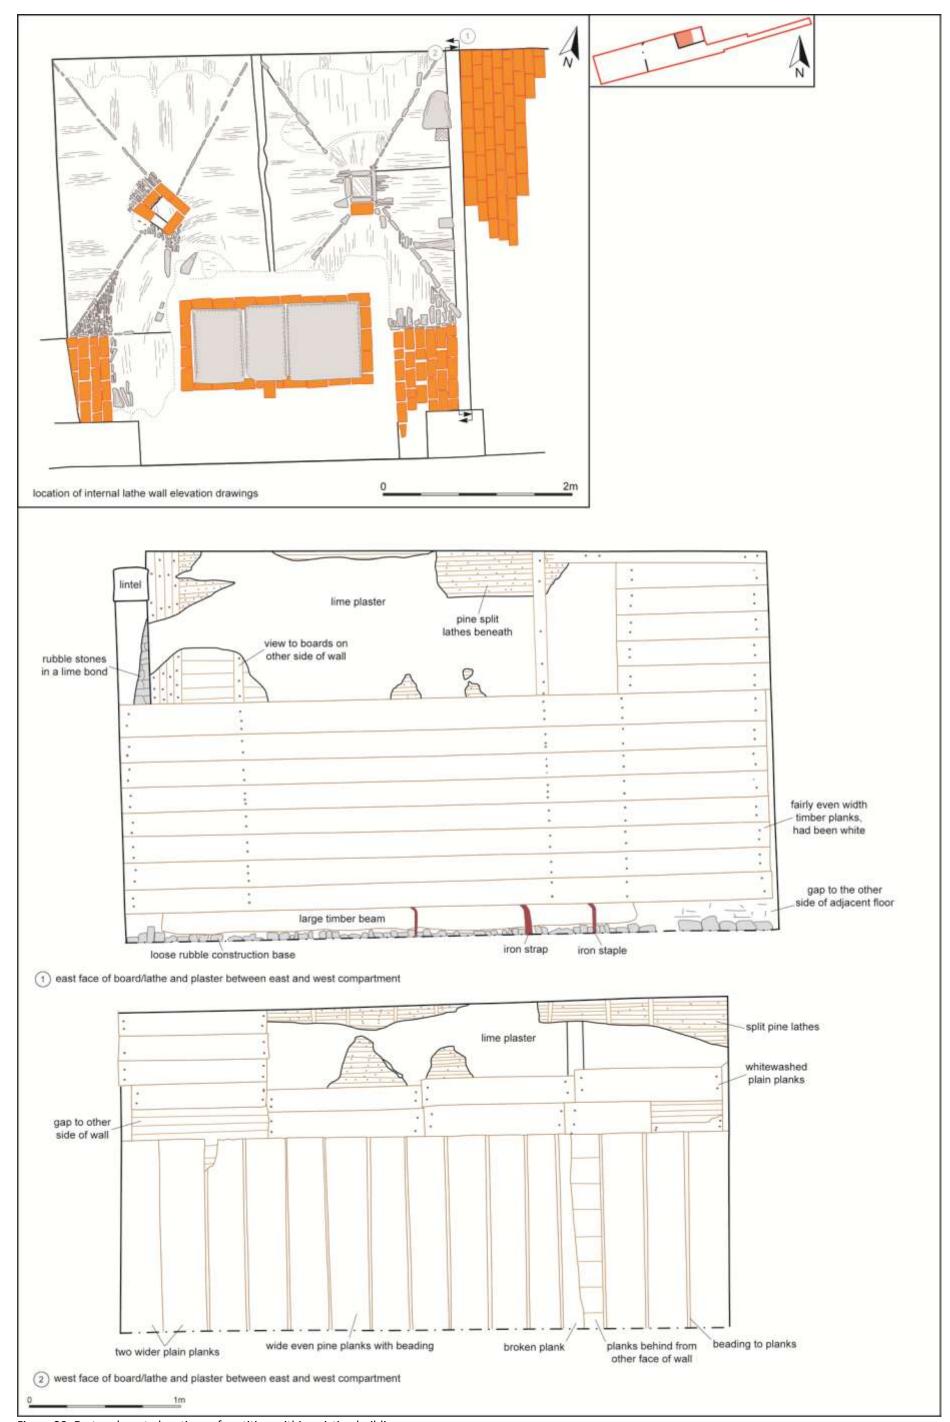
East and west elevations of partition within existing building. South West Archaeology Ltd.
